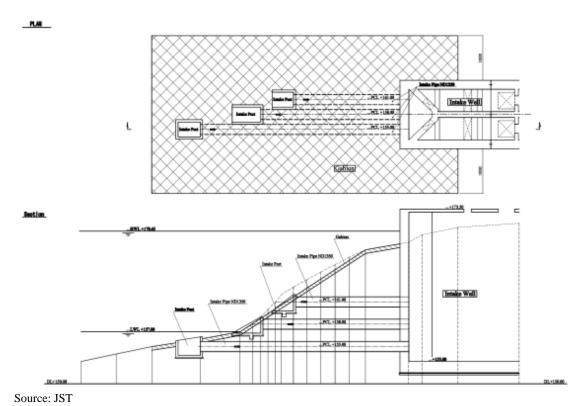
Plan and Section of the New Raw Water Intake Pump Station
